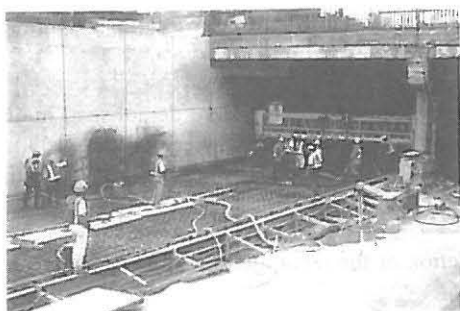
Replacement of concrete road slab using epoxy coated reinforcing steel. At this stage the refacement of the structure abutments and retaining walls is complete but the Elgin Street deck slab has not been replaced (note the significant AAR deterioration on the exposed face).
